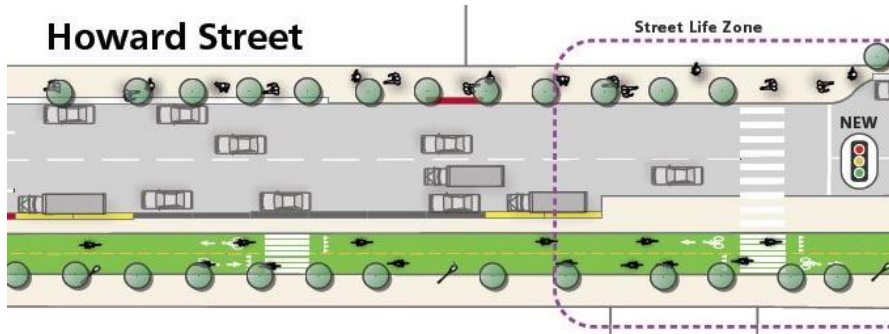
Typical Plan View of Howard Street between 5th Street and midblock between 5th and 4th
